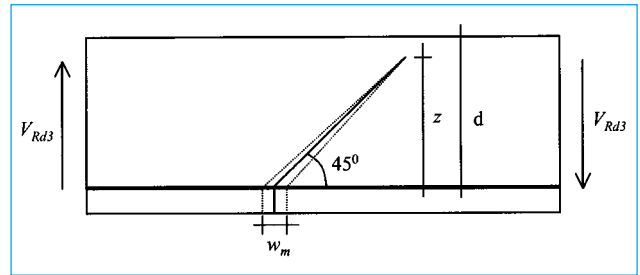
Assumed crack geometry in a beam with conventional, longitudinal reinforcement loaded to the ultimate shear loading capacity, V_{Rd3} . The crack is assumed to extend under 45° , and the crack opening at the re-bar is limited to w_m .
